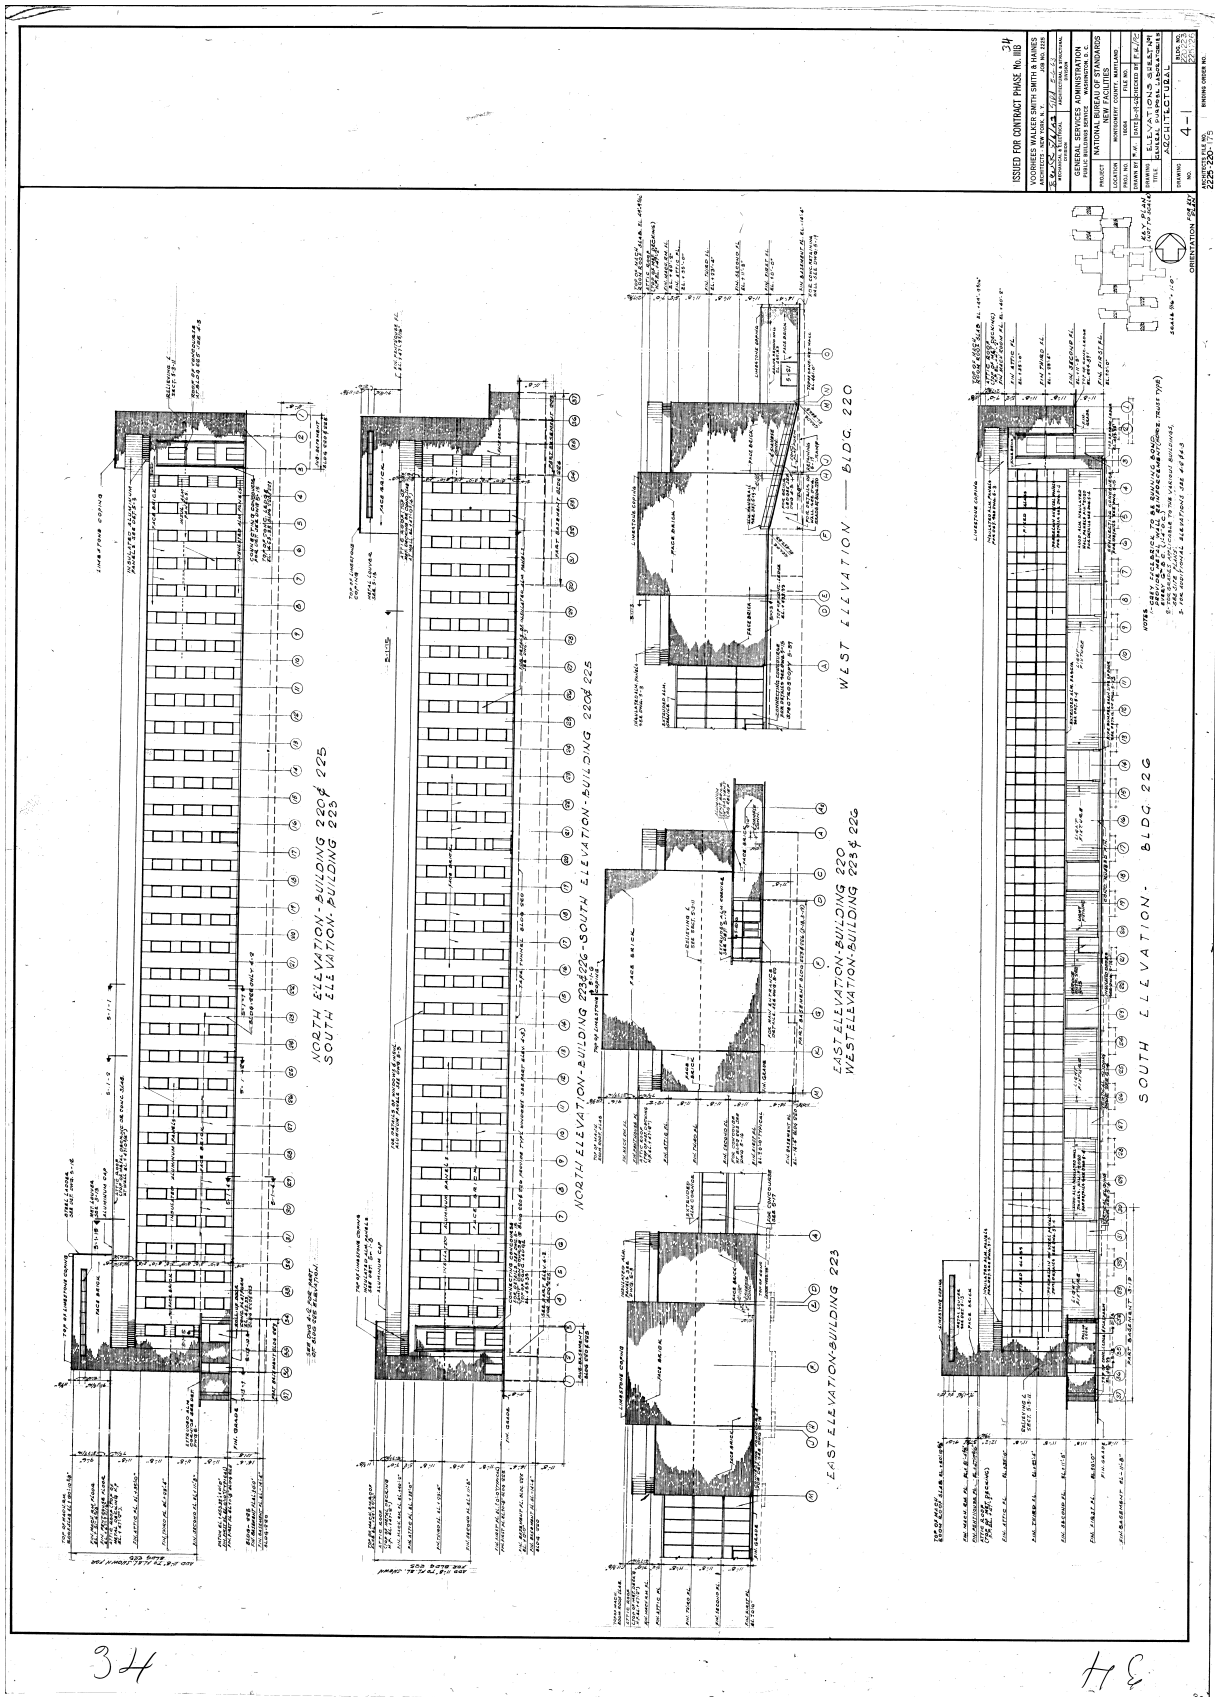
Elevations, General Purpose Laboratories (Source: Metropolitan Architects and Planners, Inc.).
